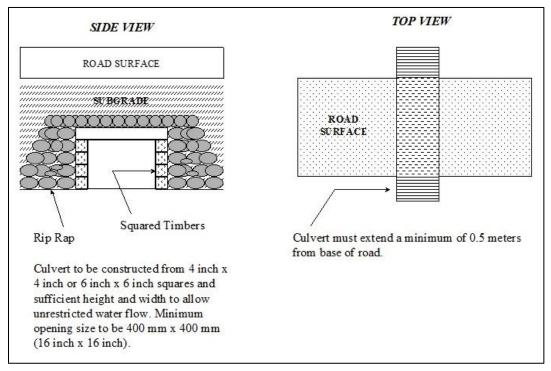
DRAWING OF BOTTOMLESS BOX CULVERT
